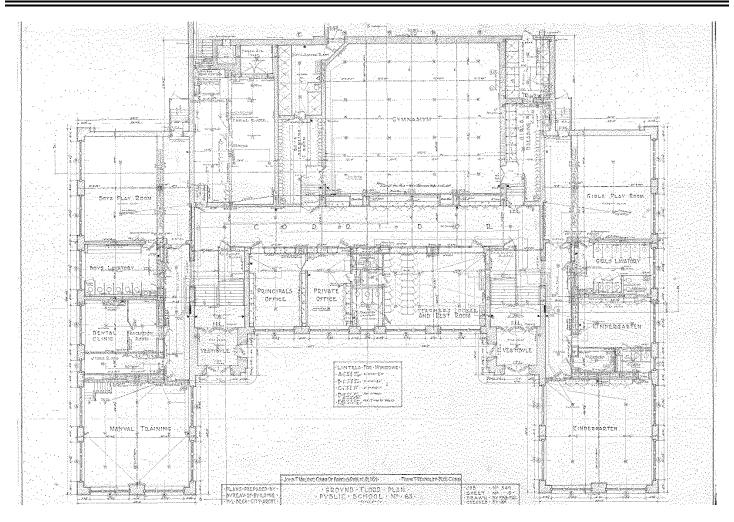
Ground floor Plan, School No. 63, Howard L. Beck, Architect, 1917.
